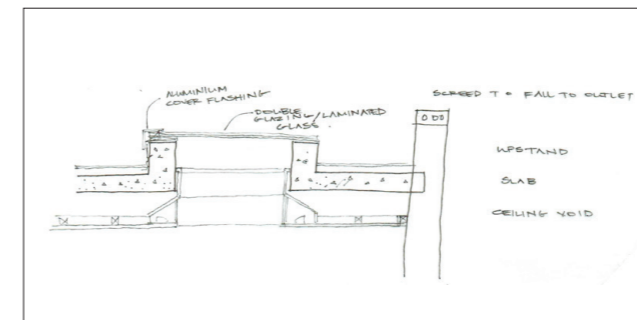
Skylight at office balcony. The quality of light in the first floor library space was poor in previous iterations. It is proposed to include a skylight at this point, with a planted screen above filtering the light, connecting users to the sky and nature from within the library.
